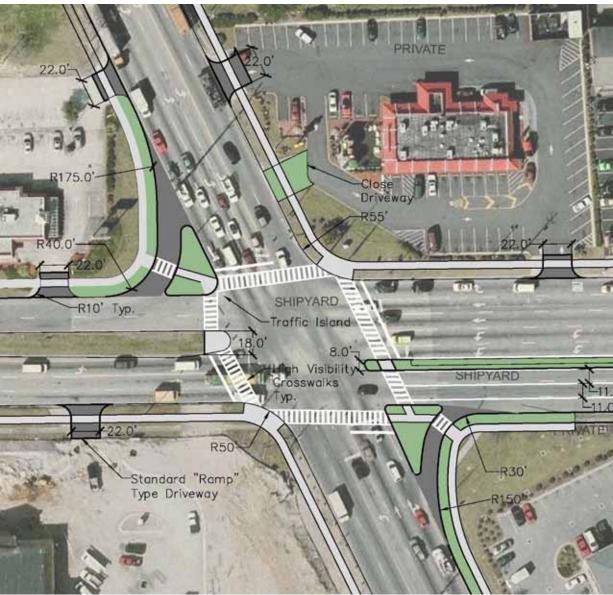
Shipyard Boulevard and Carolina Beach Road Partial Recommendations
